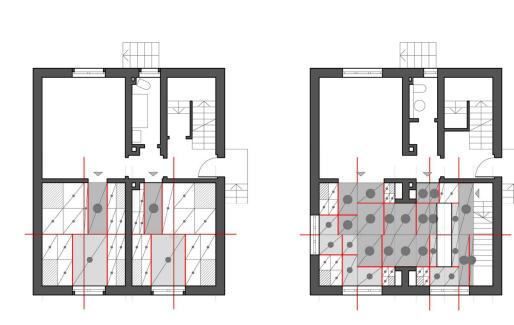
(a) and 7(b). Plans of the first floor before (7a) and after (7b) the building renovation, scale 1:300. Concavity of the living room in a residential building, Cologne, Germany, © [DETAIL]. Reproduced by permission of DETAIL. 113x53mm (300 x 300 DPI)
